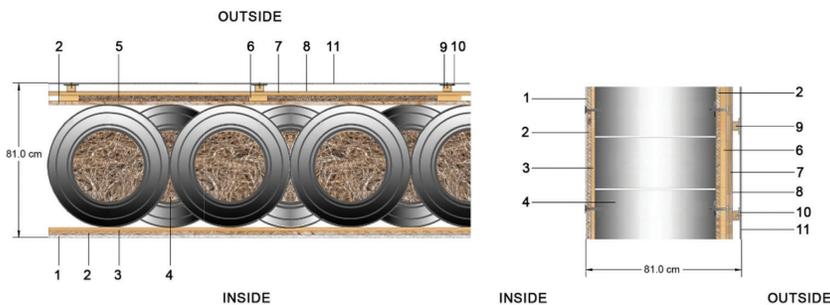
Horizontal and vertical sections of the component made from tyres. Placing in the building envelope of the classroom: North facing wall and part of East facing wall.
